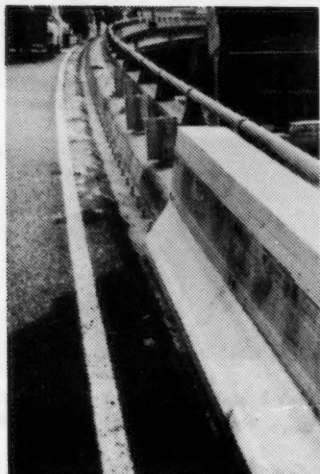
Bridge Rail Retrofit—Aluminum Barrier Shape Type
